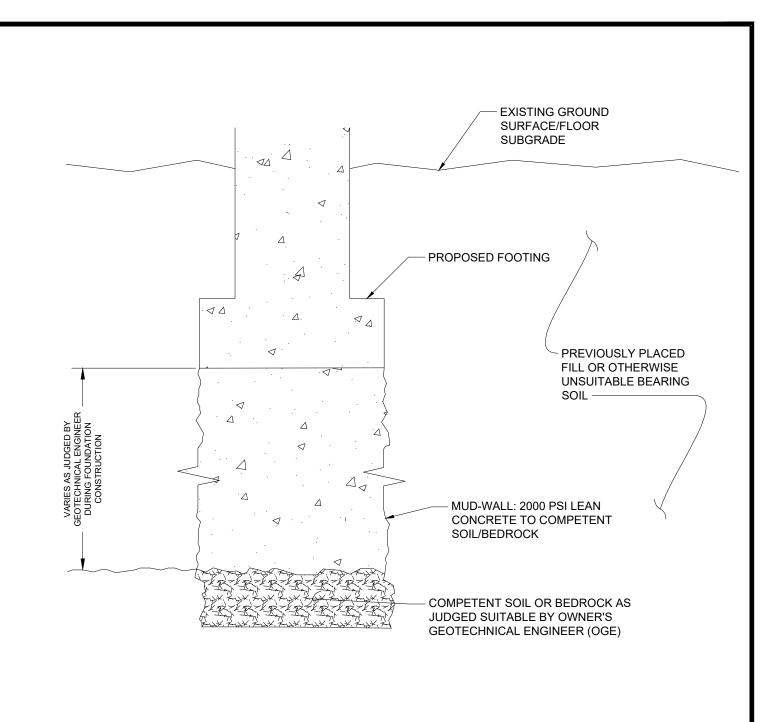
TYPICAL FOOTING TRENCH SEALS
